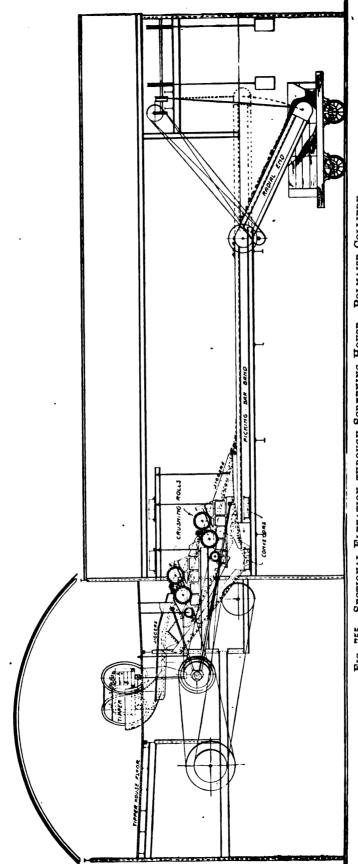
Sectional Elevation through Screening House. Polmaise Colliery.
